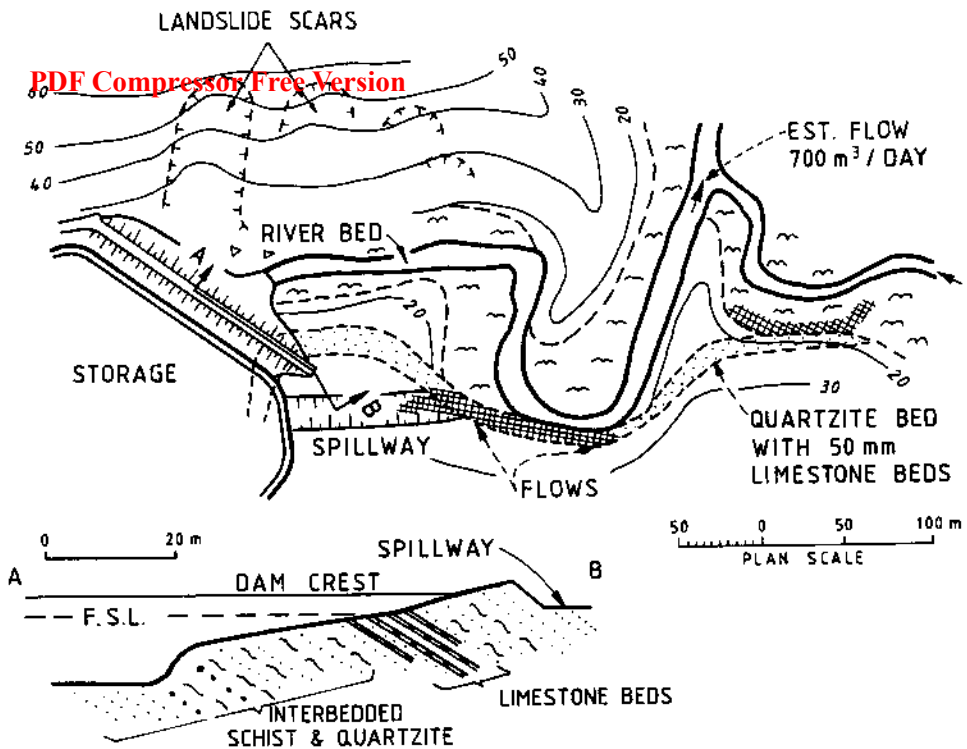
Plan and cross section of part of Congateringa Dam.
